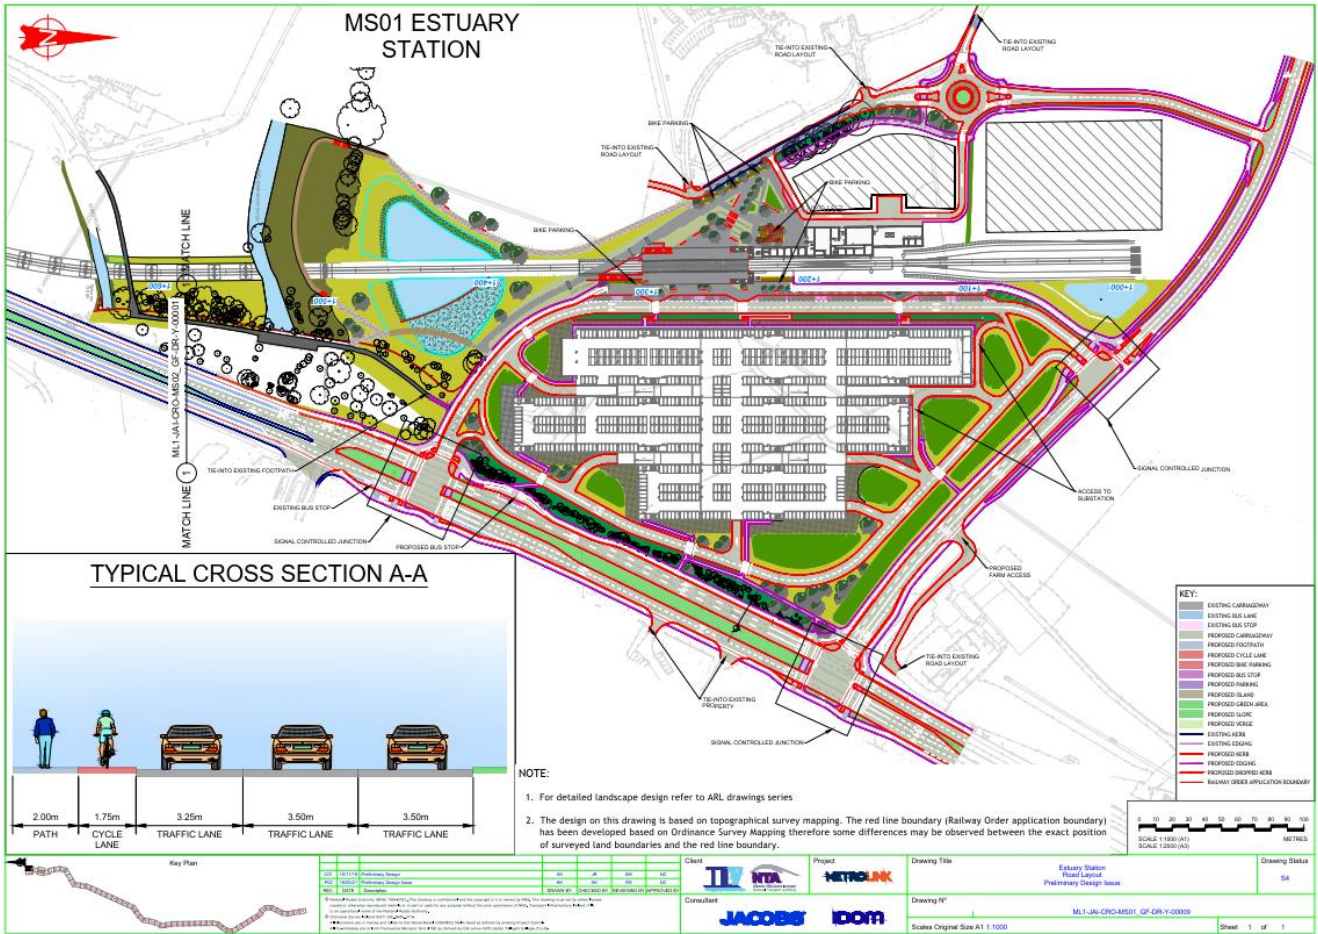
Estuary Station and Park and Ride Road Street Level Plan
